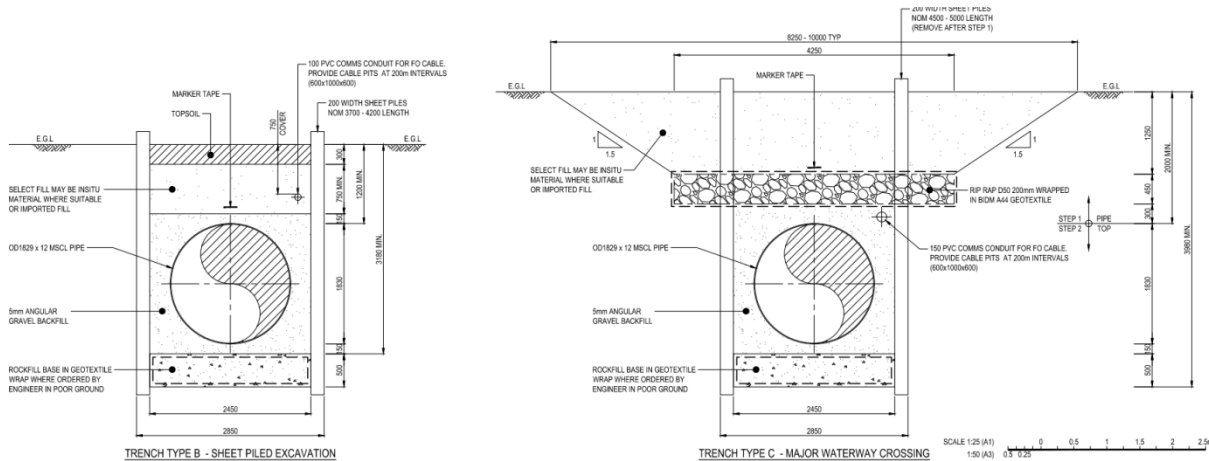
Soft Ground, Minor Road & Creek Crossing Pipeline Excavation Design
